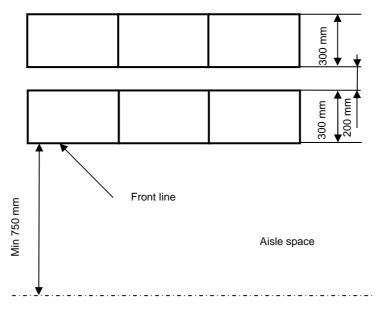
Possible floor arrangement for 300 mm dept rack/cabinet to improve the cooling (example)
